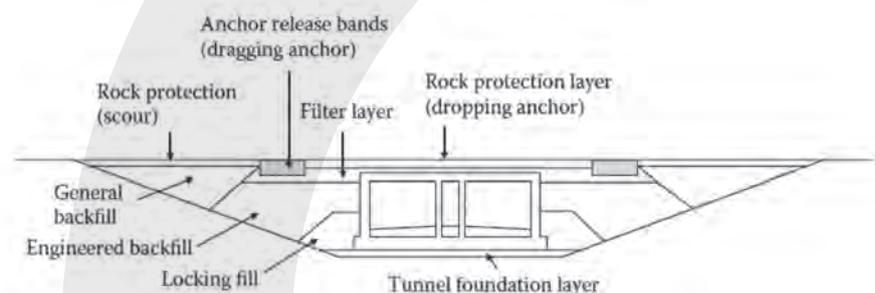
Typical arrangement of anchor release bands (ref : Immersed Tunnels, Lunniss/Baber 2013).
